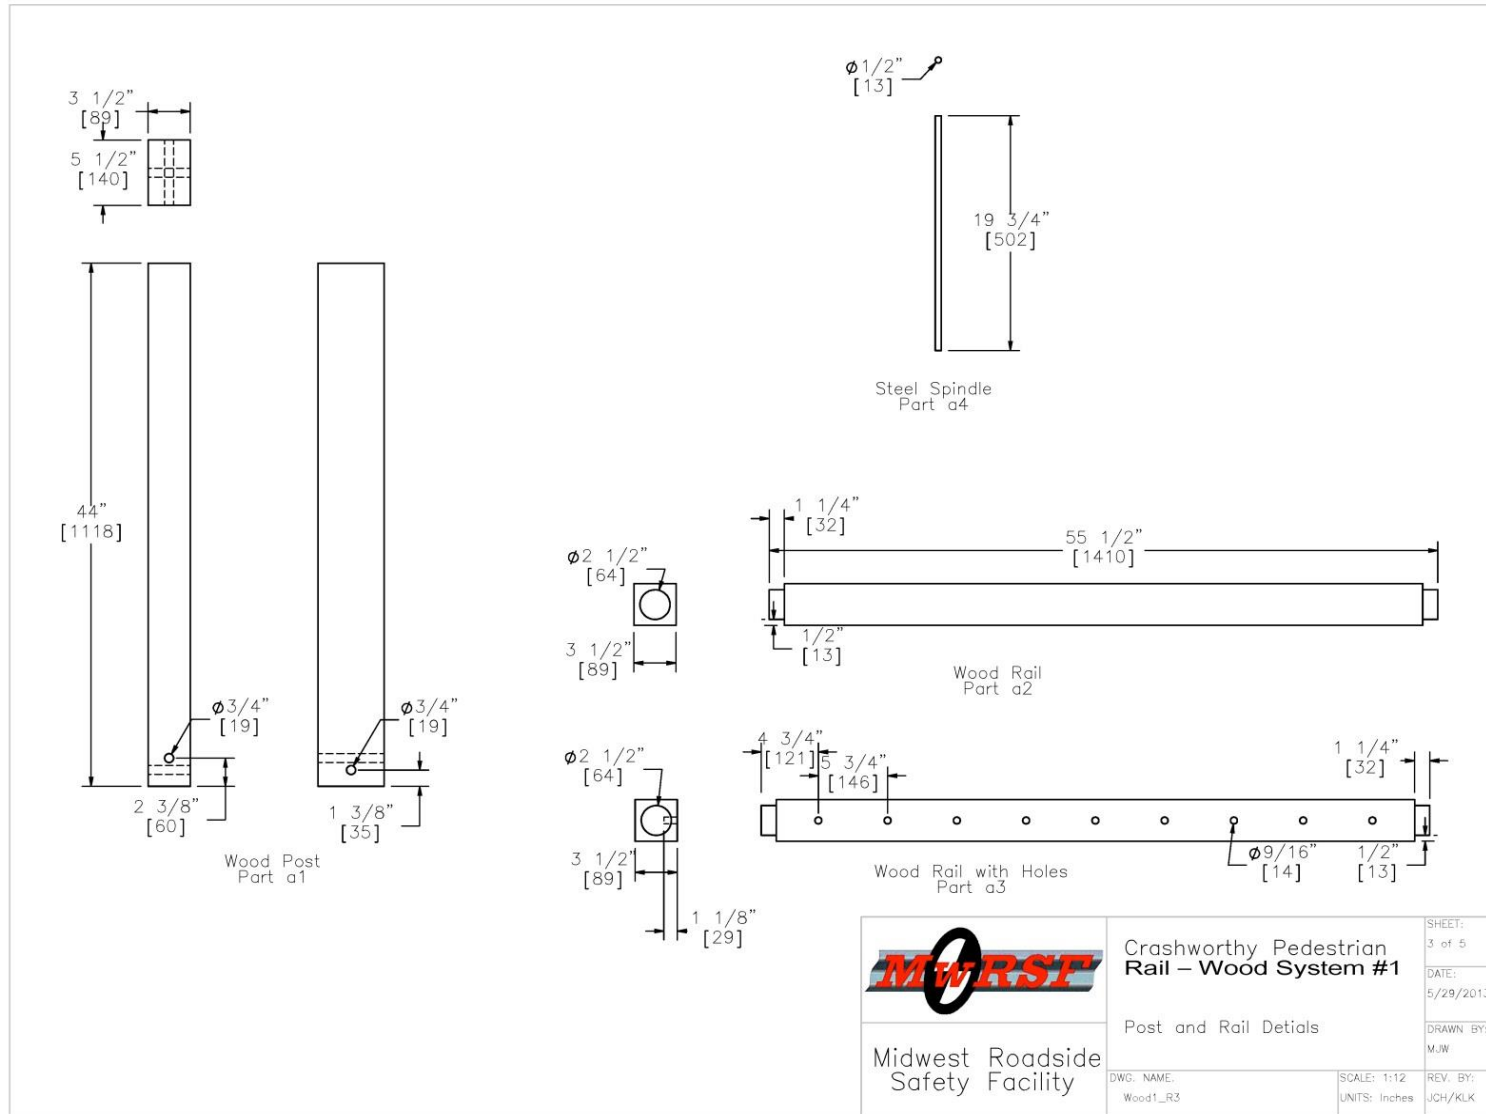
Modular Wood Rail, Design Concept WOOD1 (Sheet 3 of 5)
